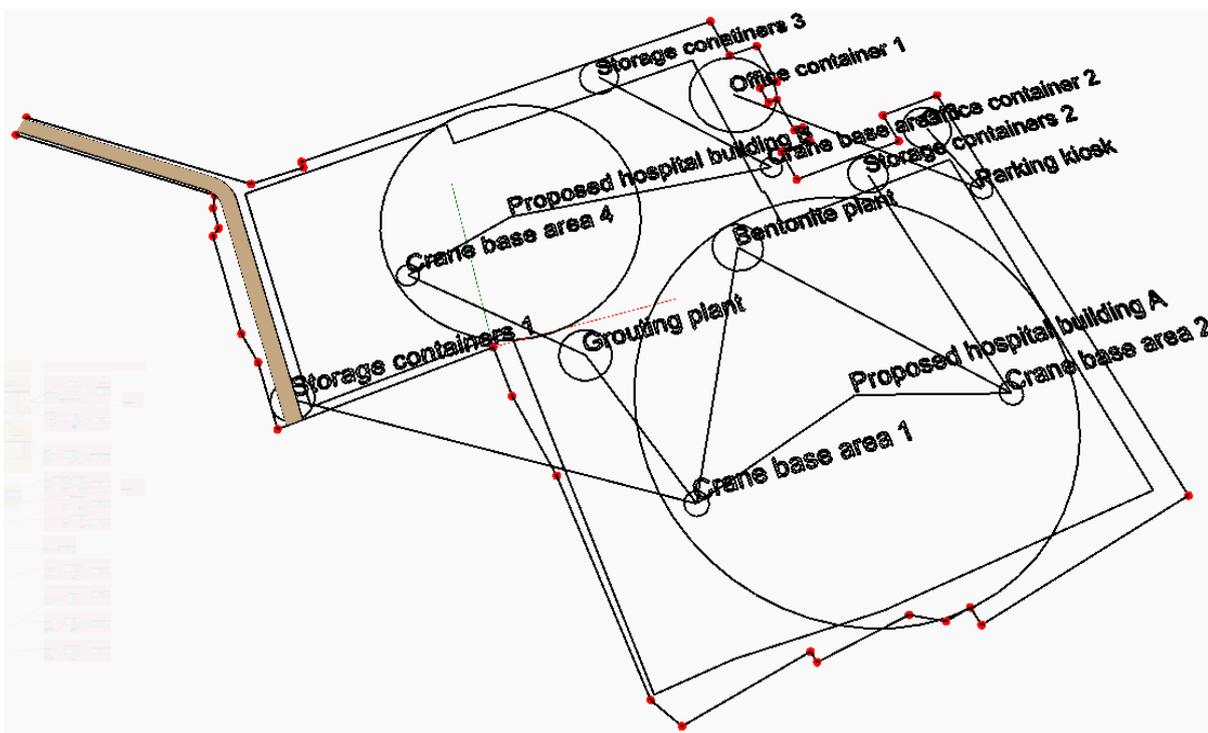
Site space layout for the hospital building project facilities and equipment
